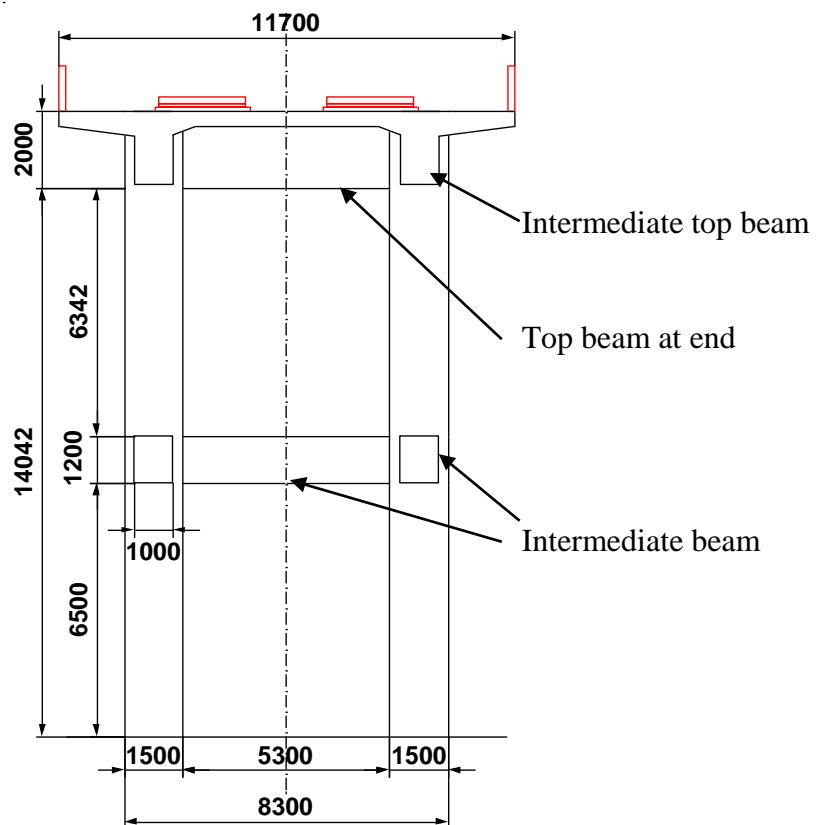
Beam and column arrangement in T-shape joint.
